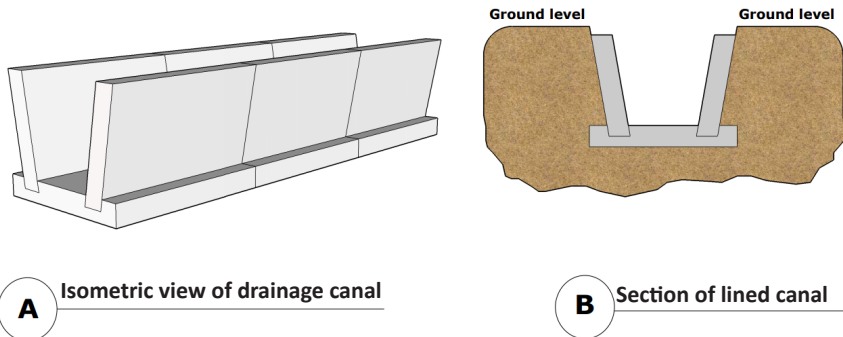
Cross section of the trapezoidal main ditch lined canal constructed at REMD farm.
